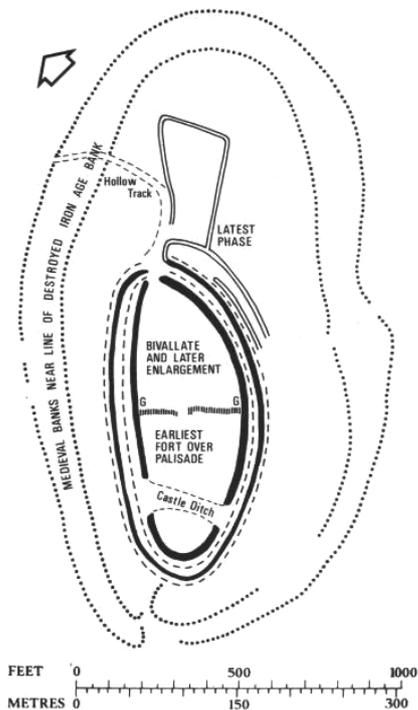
Plan of the earthworks at Castle Hill, Almondbury. (Source: Armitage 1900).
